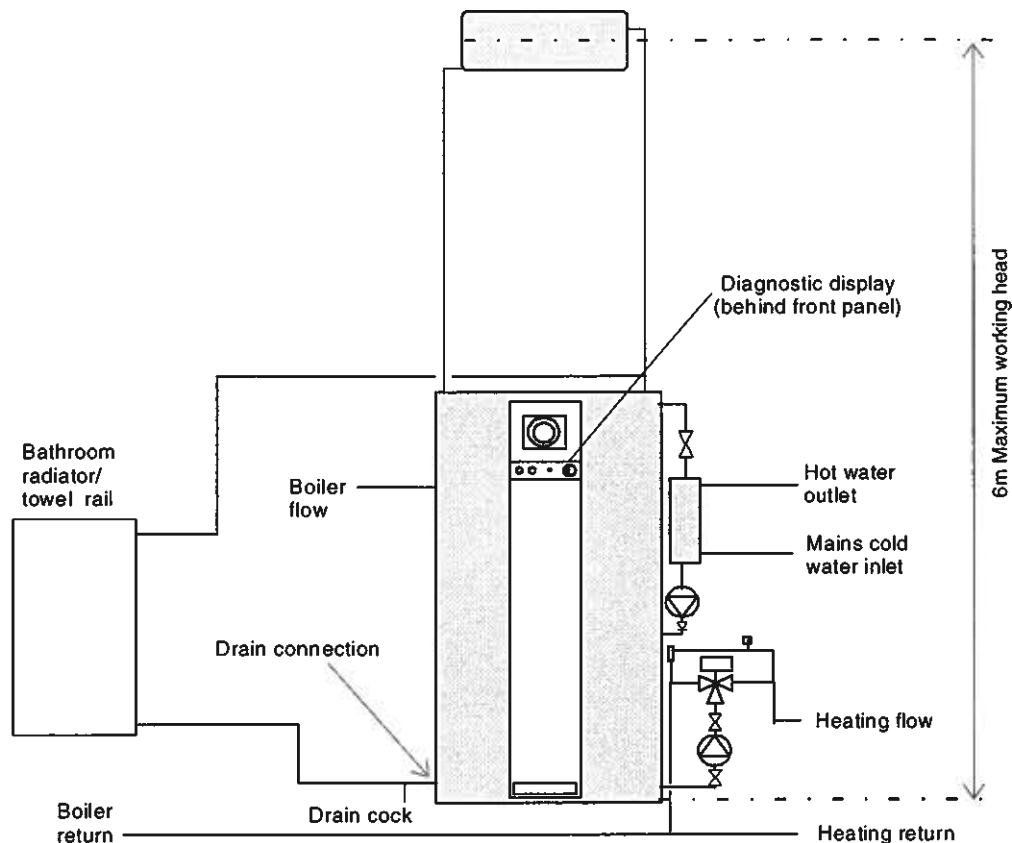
Arrangement for Connecting Bathroom Radiator or towel Rail Heated by Gravity Circulation
